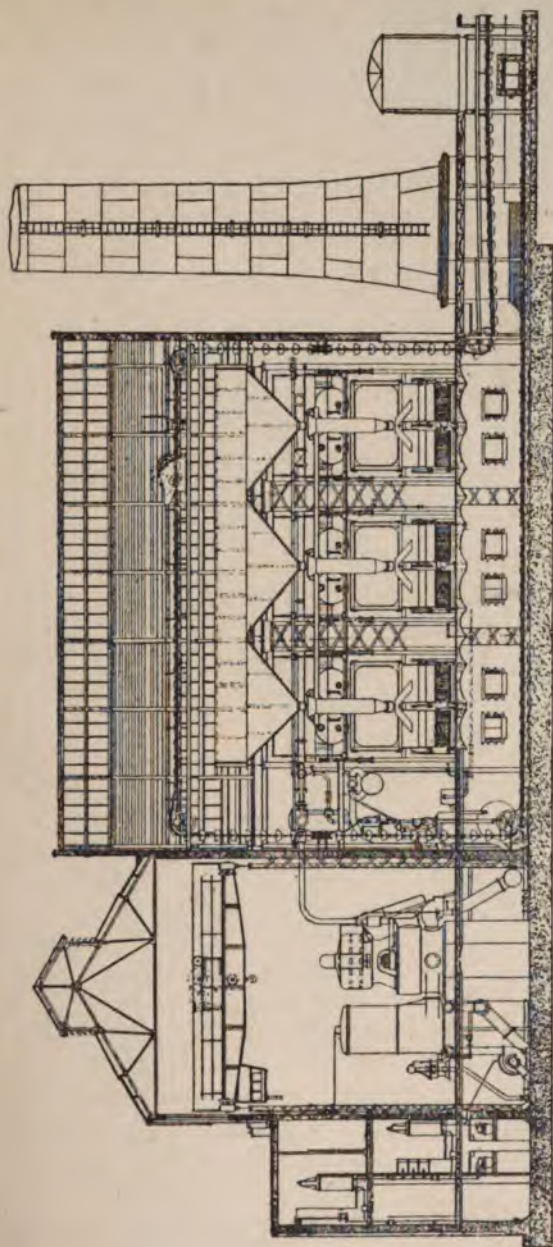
SECTIONAL ELEVATION OF THORN HILL POWER STATION OF THE YORKSHIRE POWER CO.
